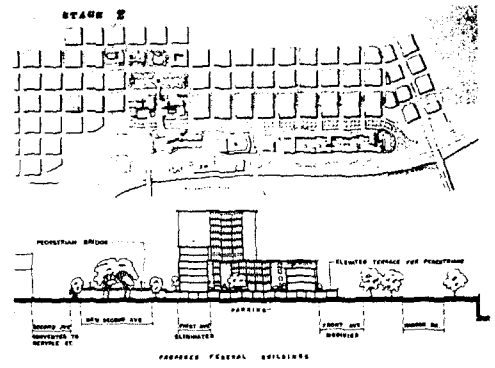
b. City of Portland, Oregon, plan with parking solution (Pencil Points, December 1944)
